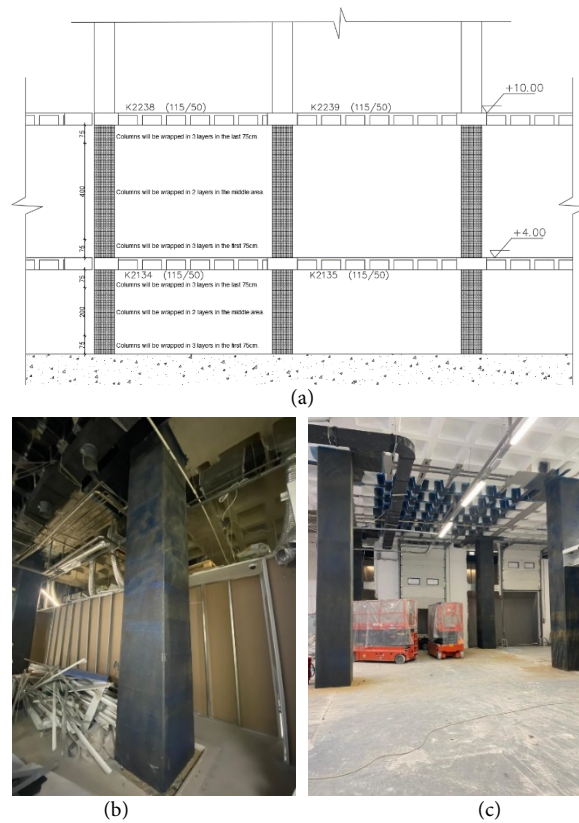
Second Floor CFRP Fabric Reinforcement (a) Project Section (b, c) Application Area
